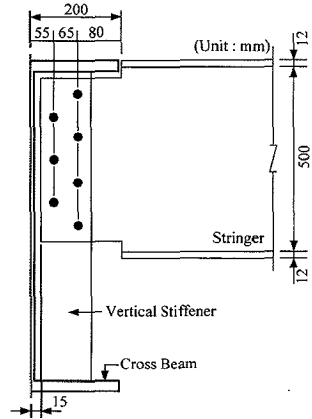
Details of the Connection between Cross Beam & Stringer.
